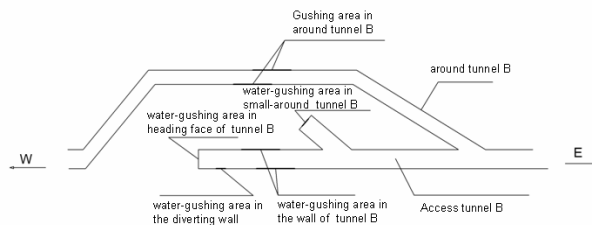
Location diagram of tunnel B , around-tunnel B and small-around tunnel B
